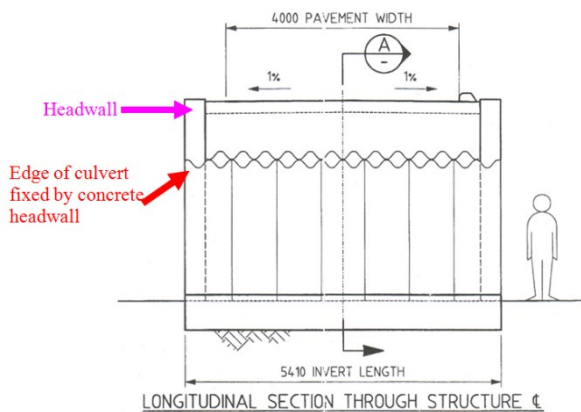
Longitudinal section through culvert 2H (Ingal Civil Products, 2002)
